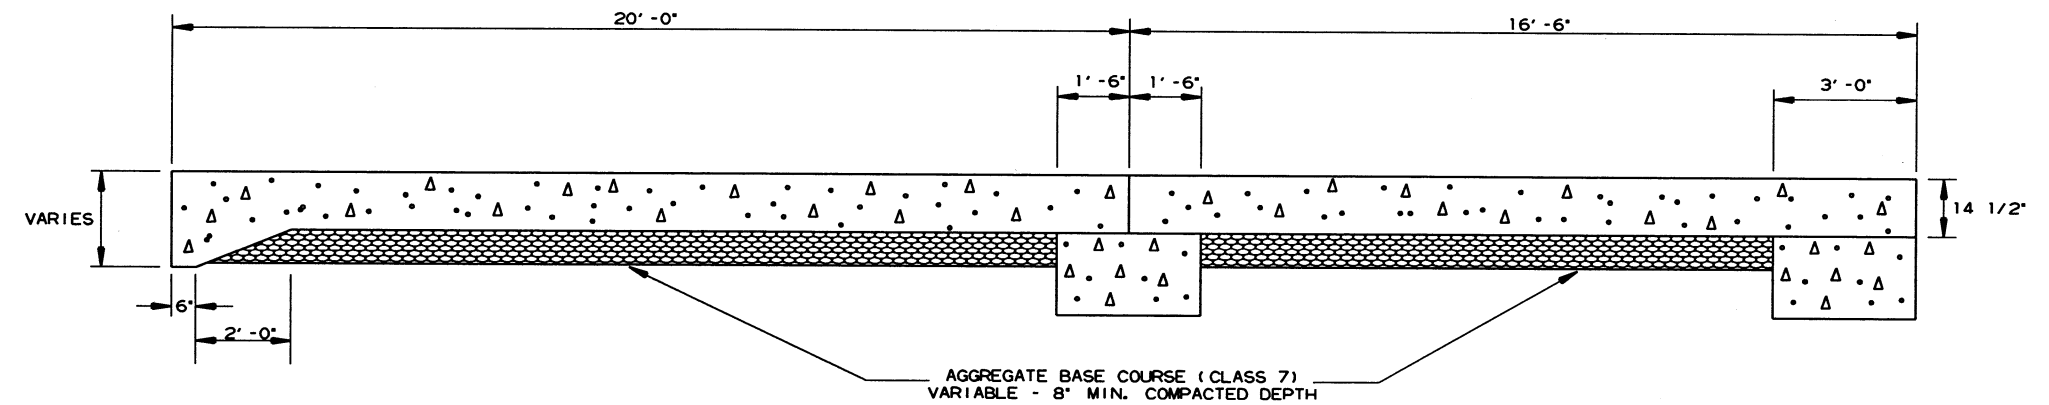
DETAILS OF JOINT SUPPORT AT BEGIN AND END OF EXISTING CONCRETE PAVEMENT ALTERNATE 2
